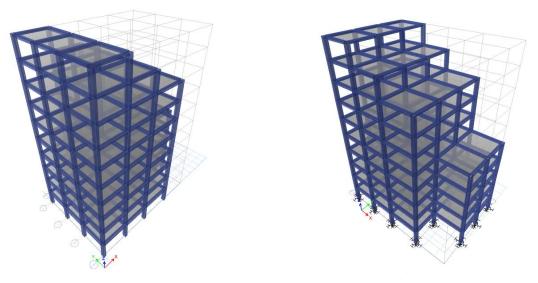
Three dimensional views of R.C.Multi-storey building with fixed base and flexible base
